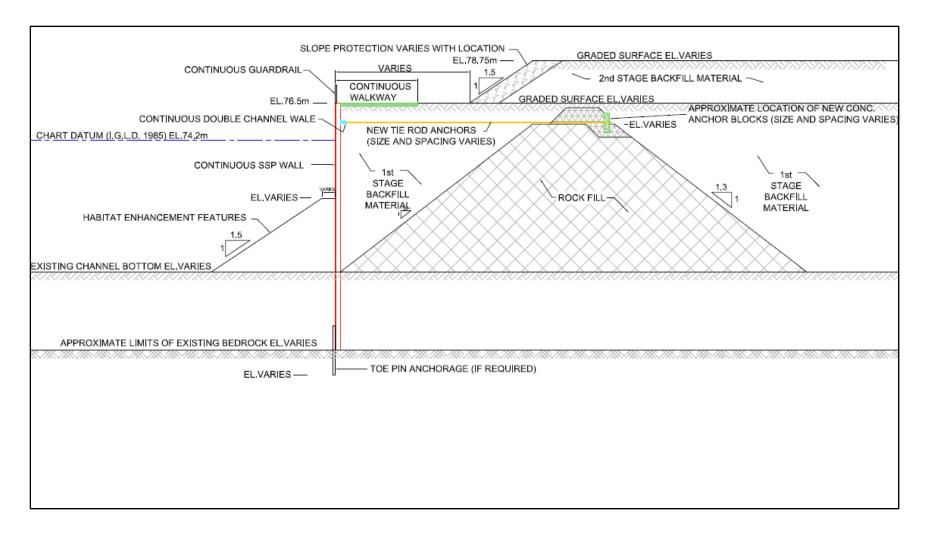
Proposed Vertical Confinement Cross Section - Generic SSP
